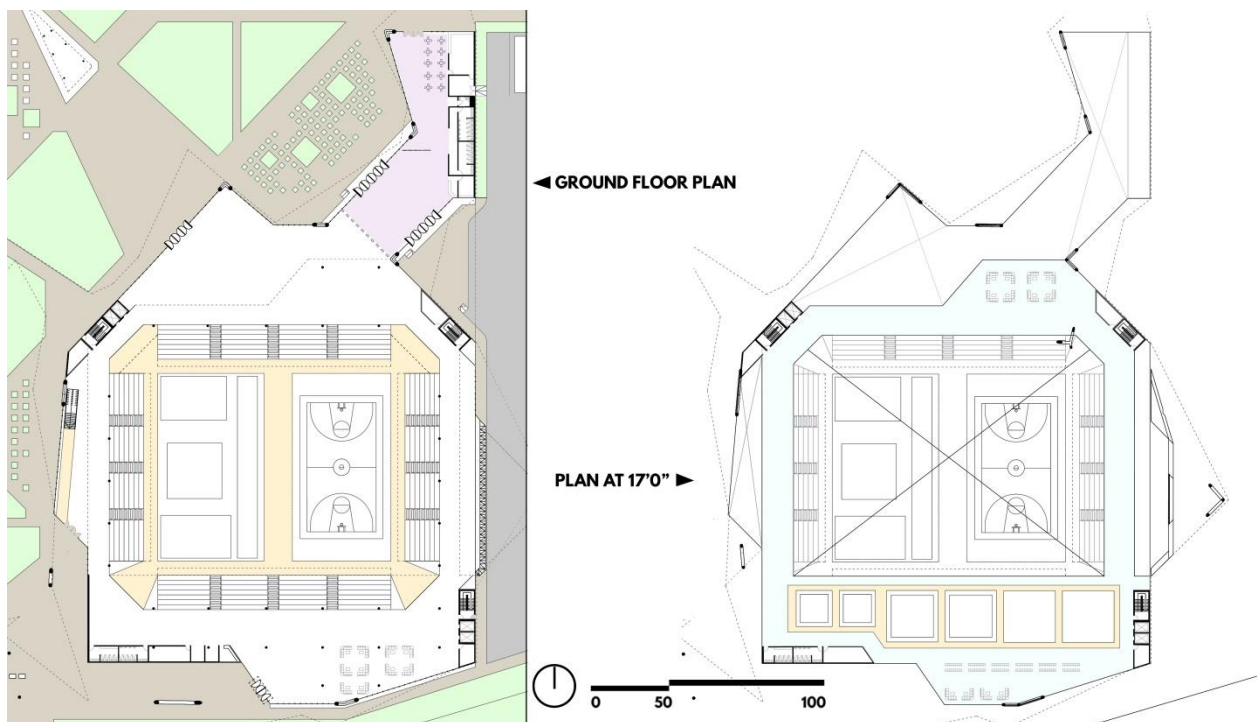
Multi-sport arena plan: Ground floor and @17'0" (Author ,2020)
